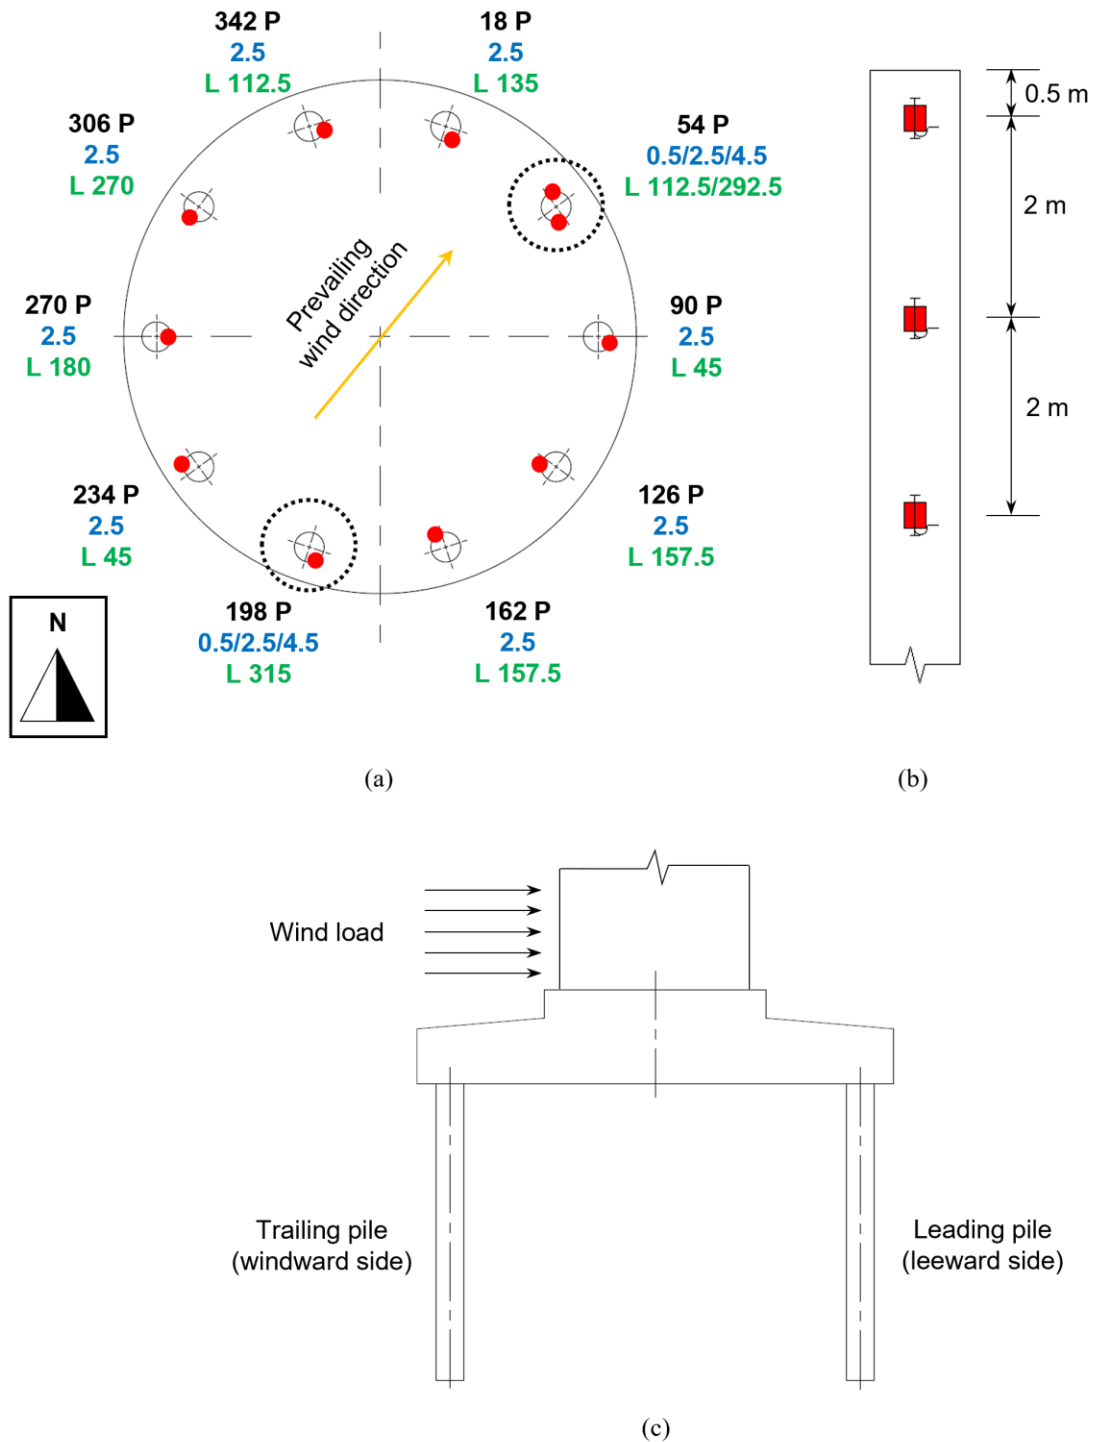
Instrumentation placement – piles: (a) plan view; (b) cross-section; (c) leading-trailing pile position relative to wind direction
